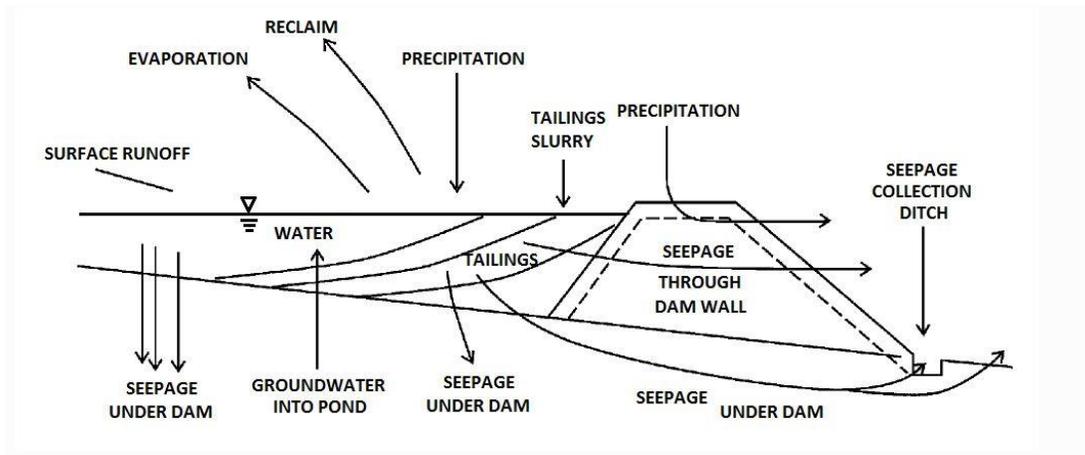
Dam water balance showing seepage through dam (European Commission 2009 cited in Niemeläinen et al.)
